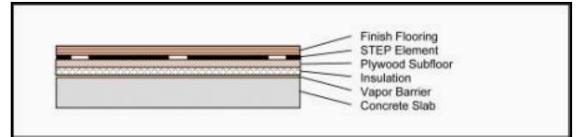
Installing Underfloor Heating Under Laminate (http://www.electricunderfloorheatingsystems.com/install-heated-floors/underwood.html)
